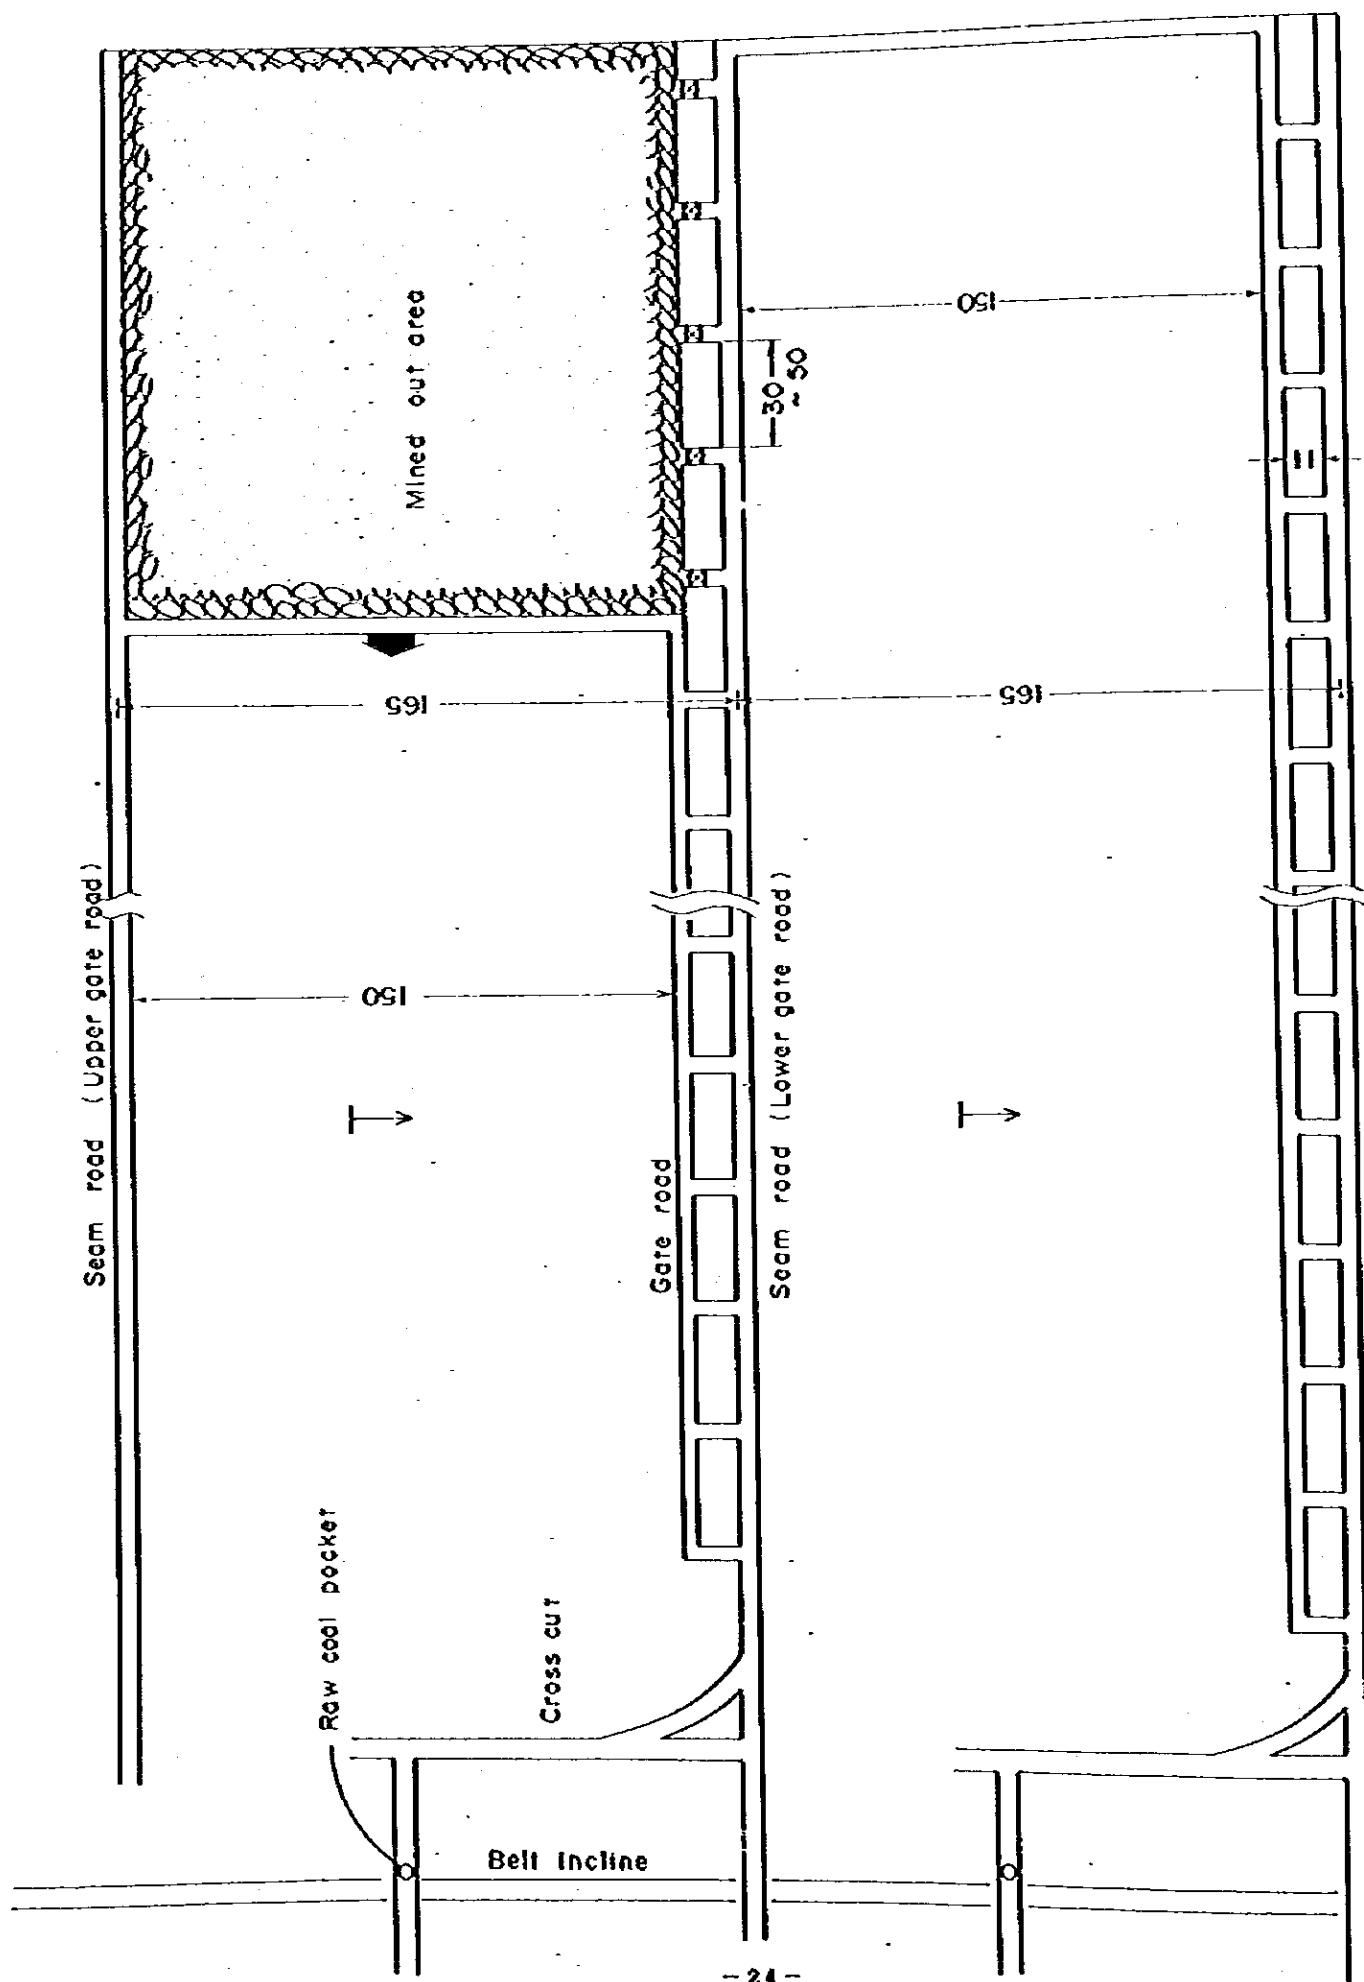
TYPICAL ARRANGEMENT OF LONGWALL PANEL
